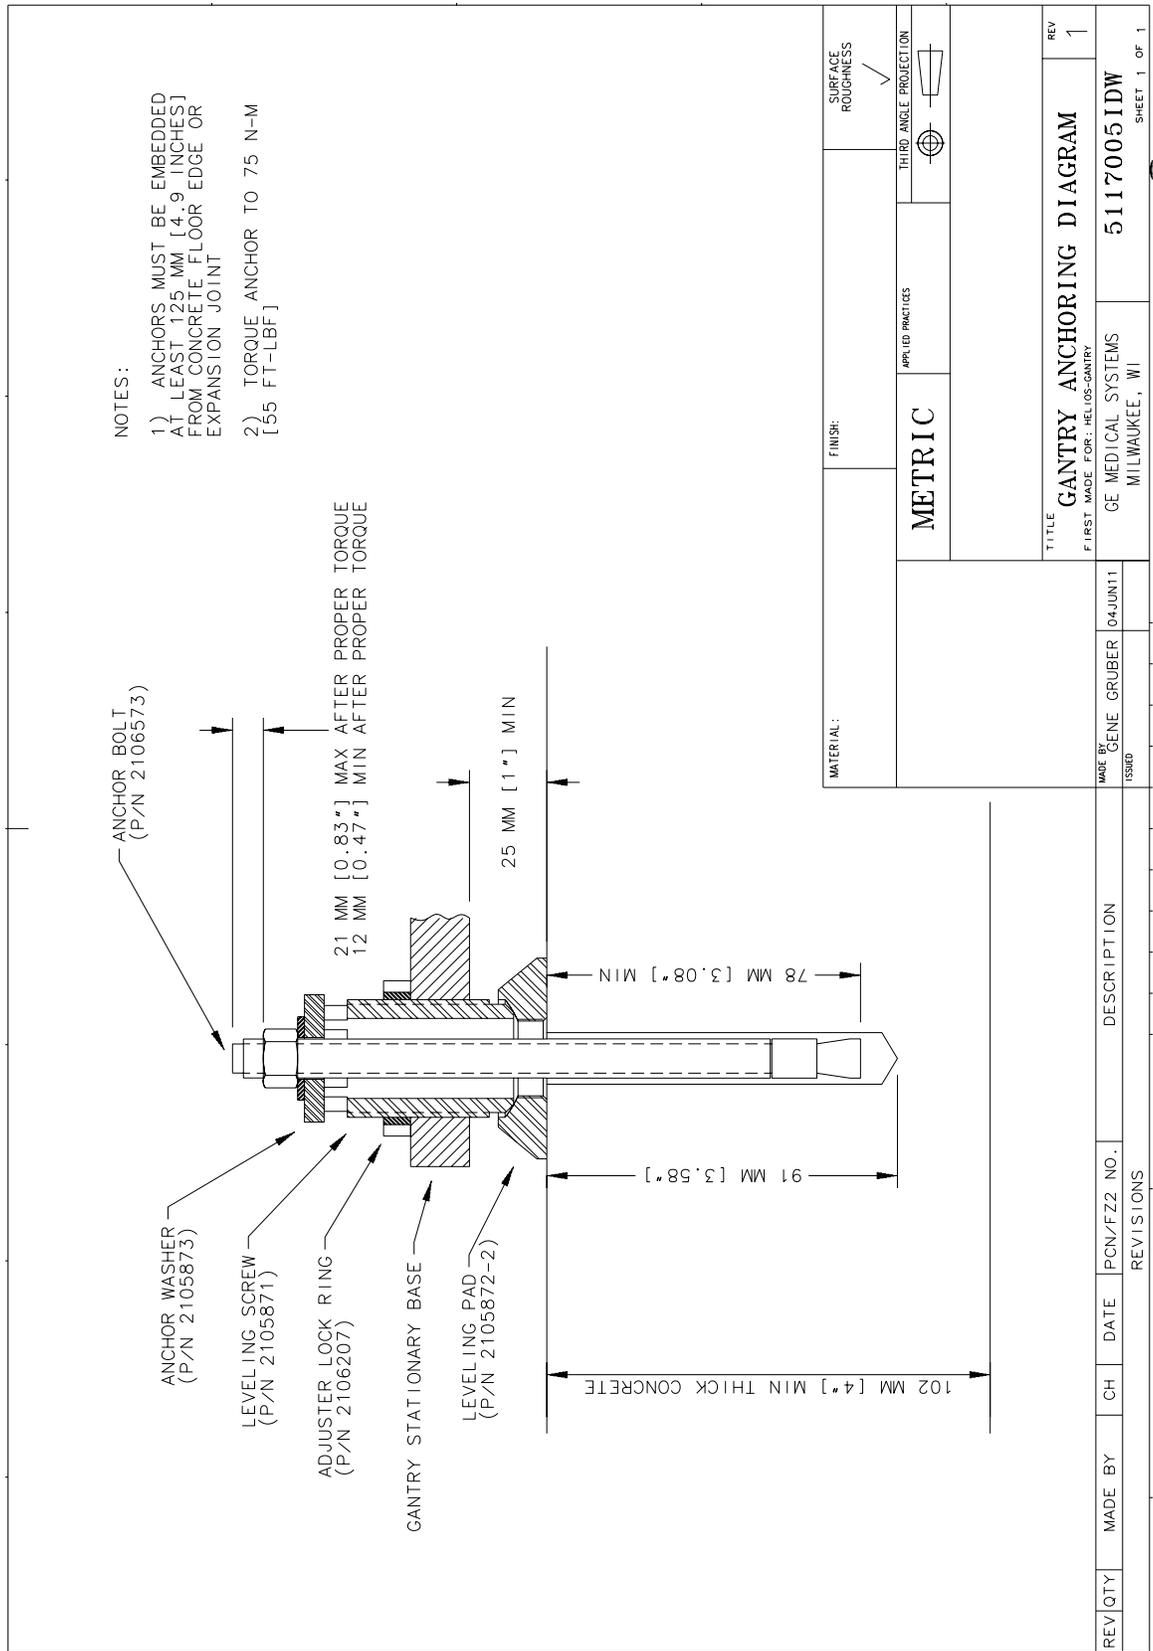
Typical Floor Anchor, Gantry and Table (GT 1700/GT2000)
